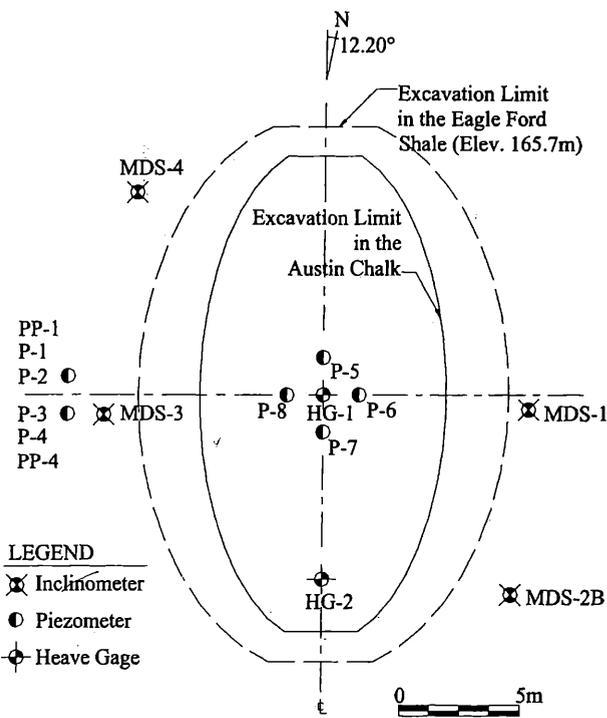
Plan View of the Instrument Locations at the N15 MDS Site
